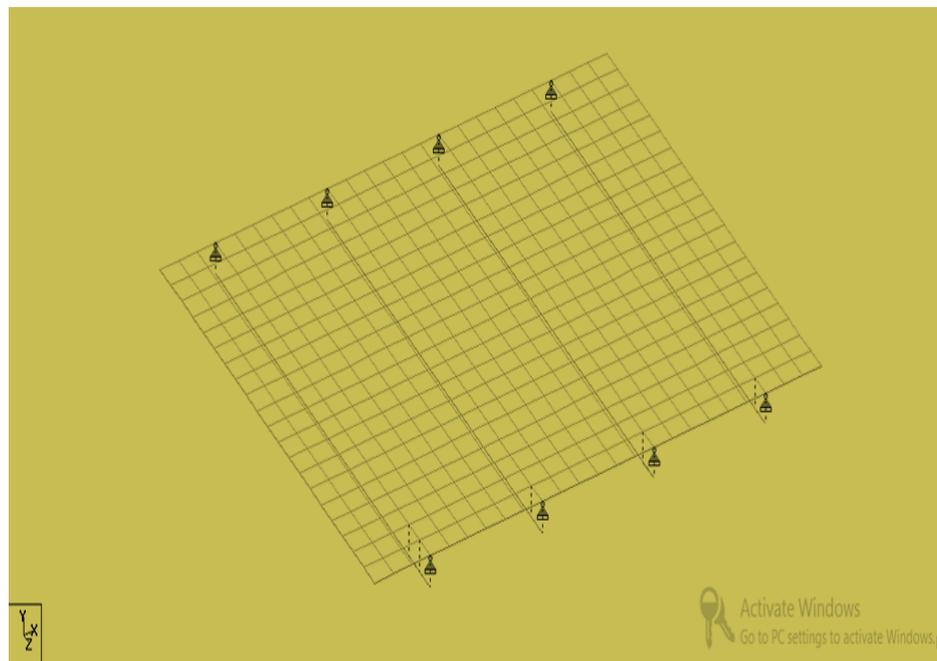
Isometric View of concrete slab and four supporting girders (480 plates)
